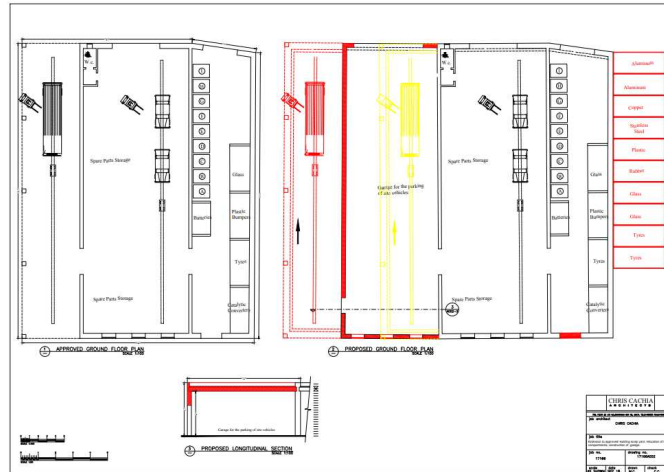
Proposed ground floor. Source: PA 3854/18/48a
